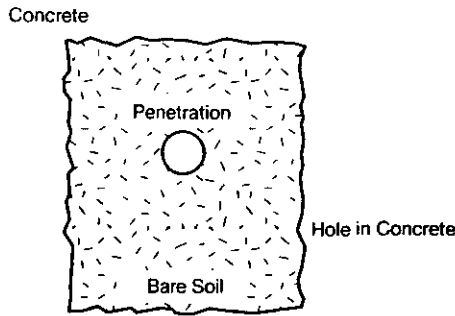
Top view of a piece of concrete excavated for utility relocation.
